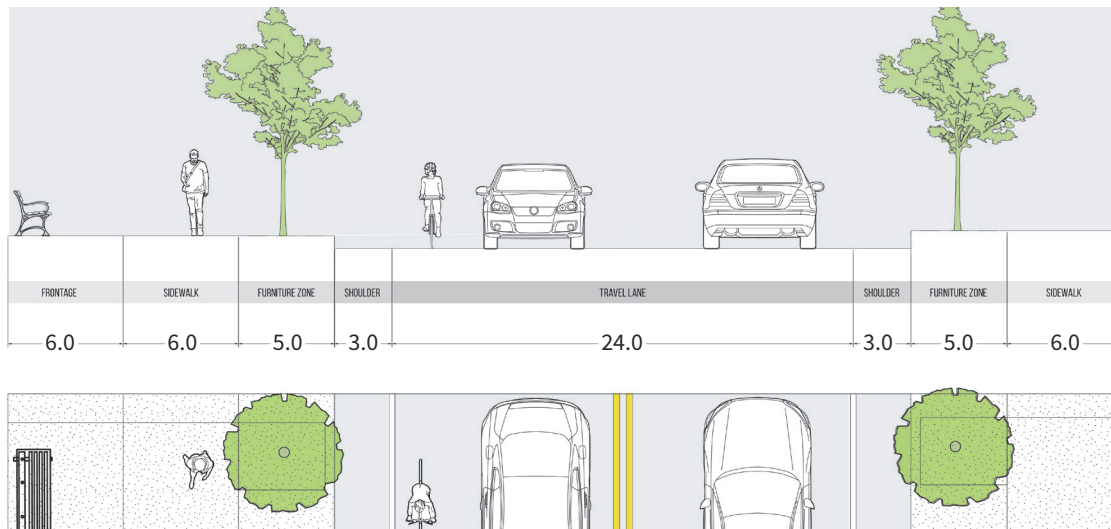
2. Typical roadway section. Courtesy of BREC.
